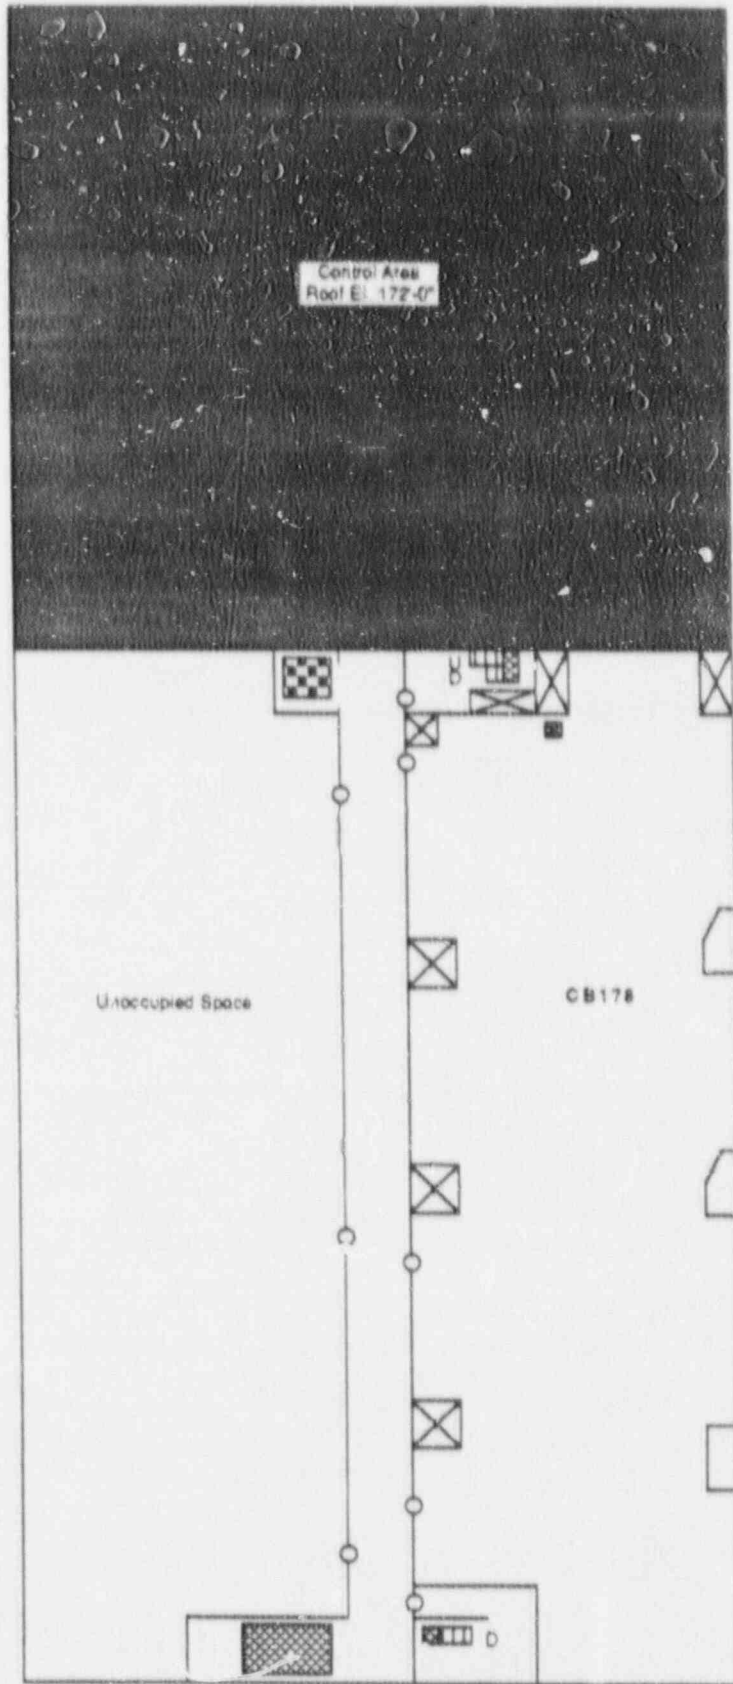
Hope Creek Control/Diesel Building Elevation 178'-0"
